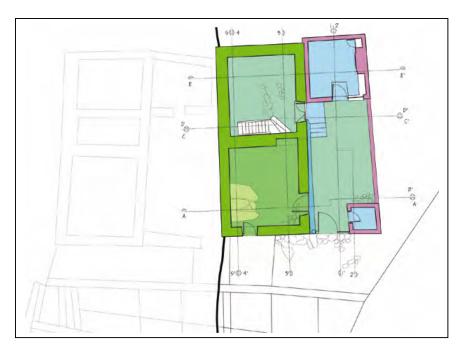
Mapping of material and construction systems on plan at +1.00
